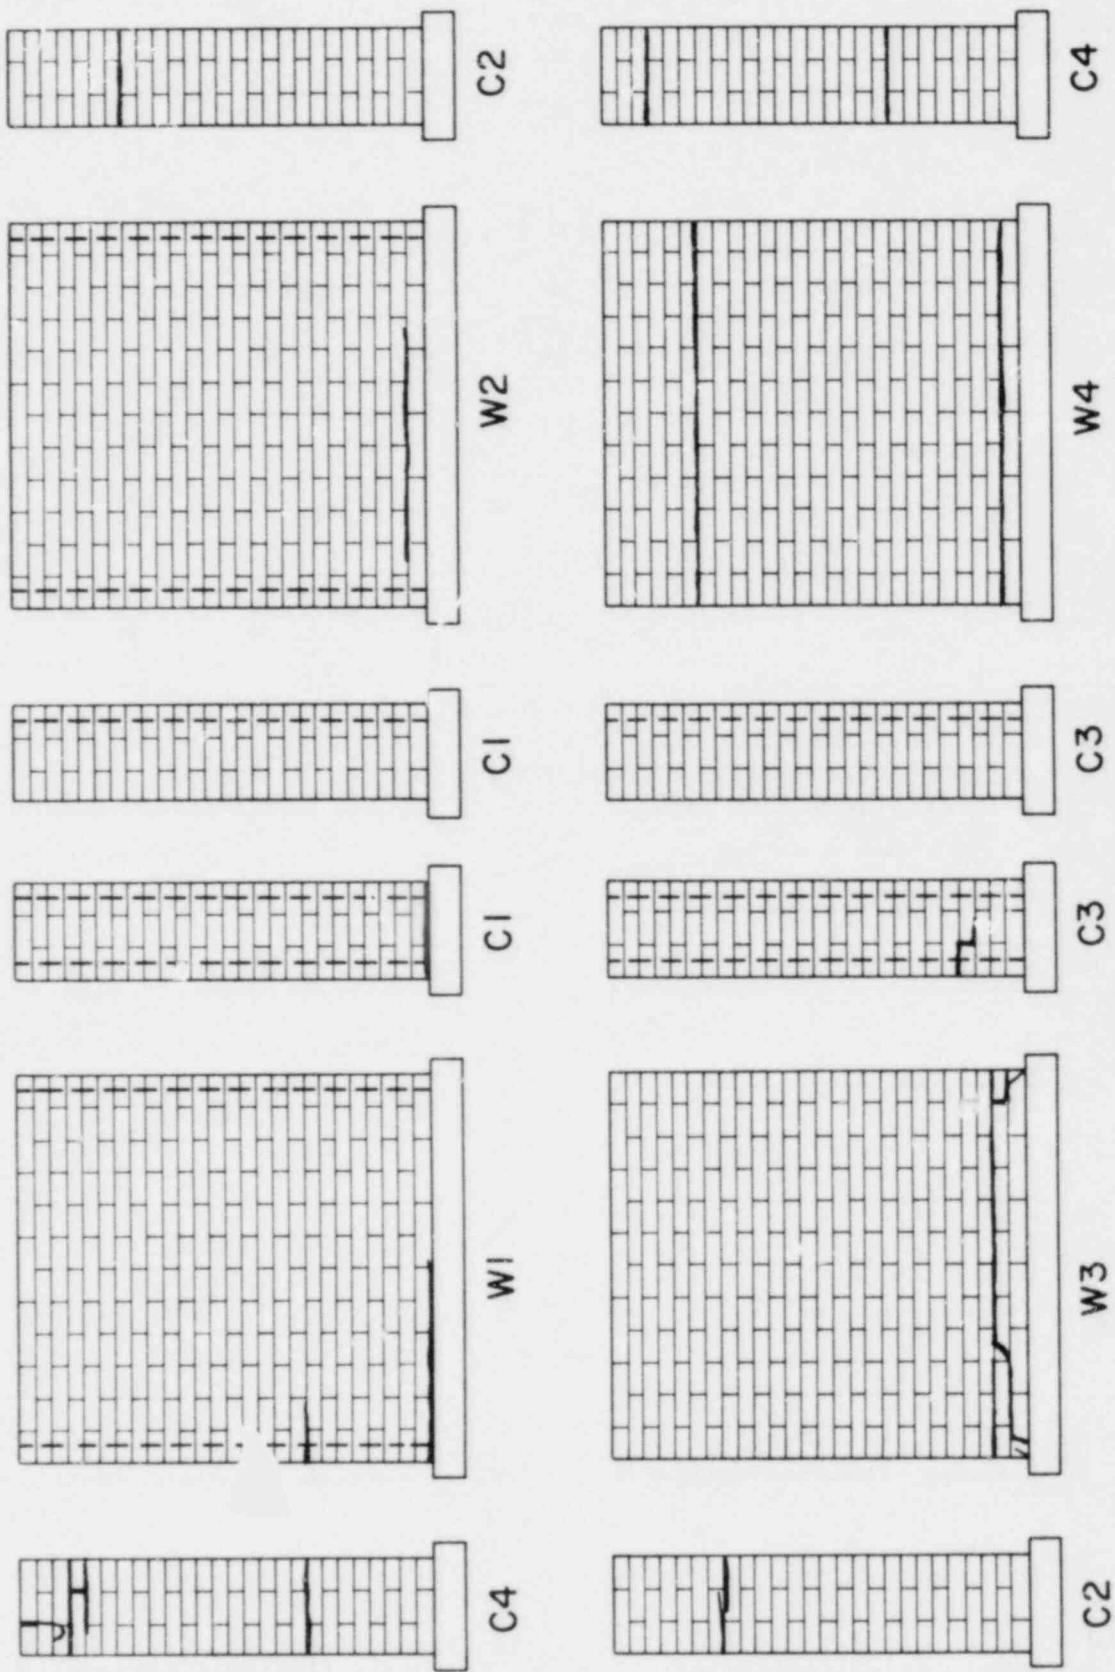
(h) DISTRIBUTION OF CRACKS IN THE MASONRY COMPONENTS: HOUSE 1, AFTER TEST 28
